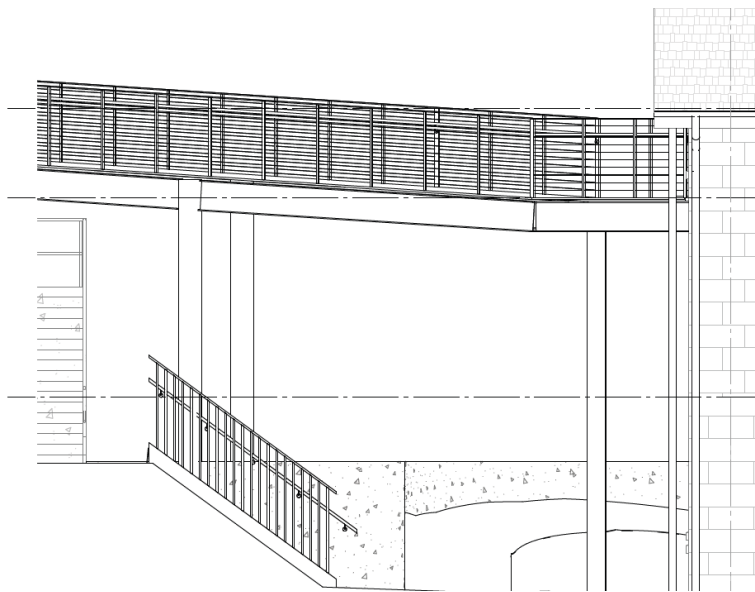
Elevation of proposed new pedestrian bridge and railing design.
